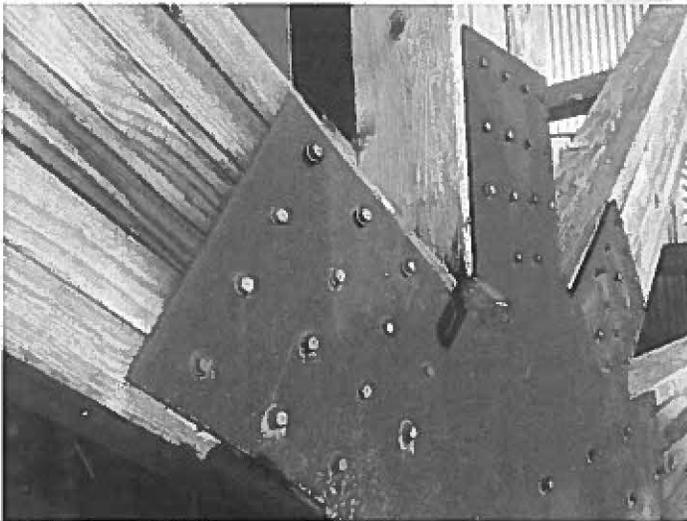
Typical side plate connection. 1/4" thick painted steel fastened with wood screws. This photo is of the intersection of the outer truss bottom chord with the king post and webs. The screws are rusted and some are loose. The plate is also loose. Note how the acute angles formed by the intersecting timbers are facing up and form a trough which can collect and hold water. Note also that the screwdriver bottoms out in rotted area behind side plate. Other side plate connections are in similar condition.
